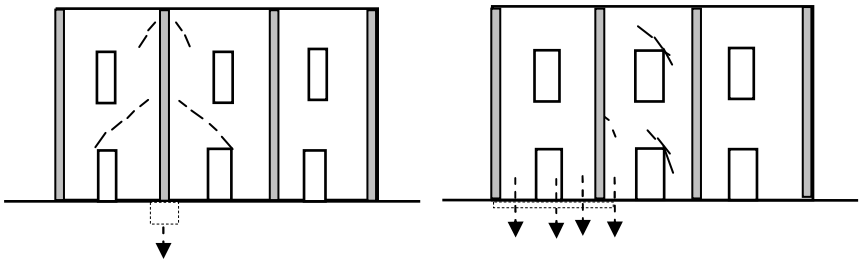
and 7.25. Detachment cracks due to rotation (left) or subsidence (right) of a facade wall
